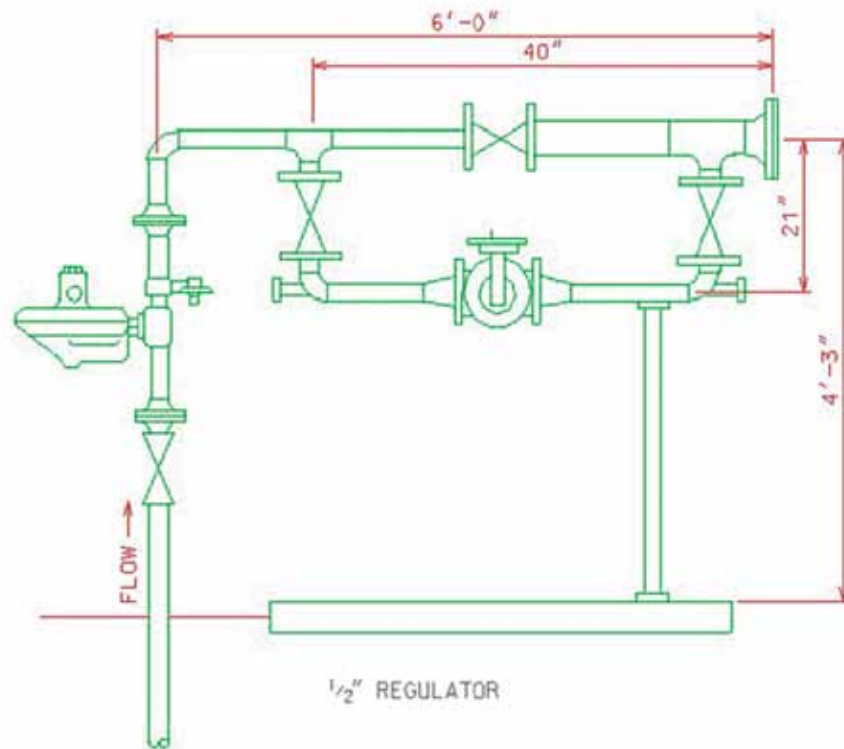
This is a typical outside meter rack. This installation could be put inside the building, but the meter location needs verification by MGE's Gas Engineering Department. This rack will extend on an outside wall from left to right or right to left depending on available space. MGE would prefer the gas regulating equipment to be outside, but if circumstances dictate it being inside, we will consider installing it with the meter set. The wall to the front face of the meter is approximately 3 feet. MGE requires the contractor to install meter protection posts and brackets to protect the rack/meter from damage. All designs of this and clearances will be verified by the Gas Engineering Department. MGE also requires the contractor to core holes in the wall of the building so associated gas pipes can be installed in the basement and vent lines can exit. Exact size and placement will be agreed on at the time of installation. This drawing is to be used as a general reference by engineers, architects, and designers. Loads and meters vary, so actual gas meter racks will likewise vary. Actual design can be verified with the Gas Engineering Department along with questions as to design and placement.
